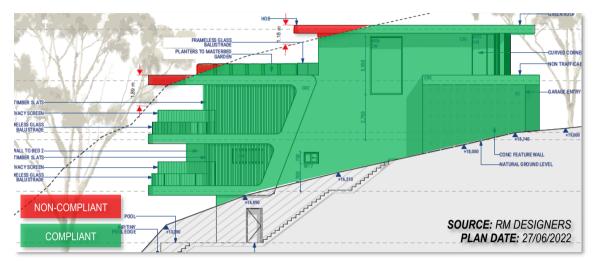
EXTRACT AND MARK-UP FROM SOUTH ELEVATION INDICATING HEIGHT LIMIT BREACH
